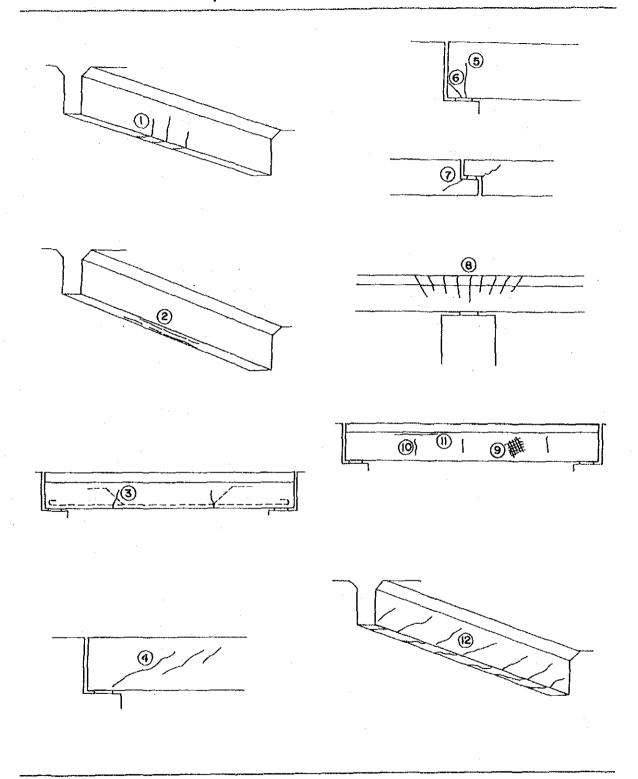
LOCATION & TYPE OF TYPICAL CRACKS IN PC SUPERSTRUCTURE
